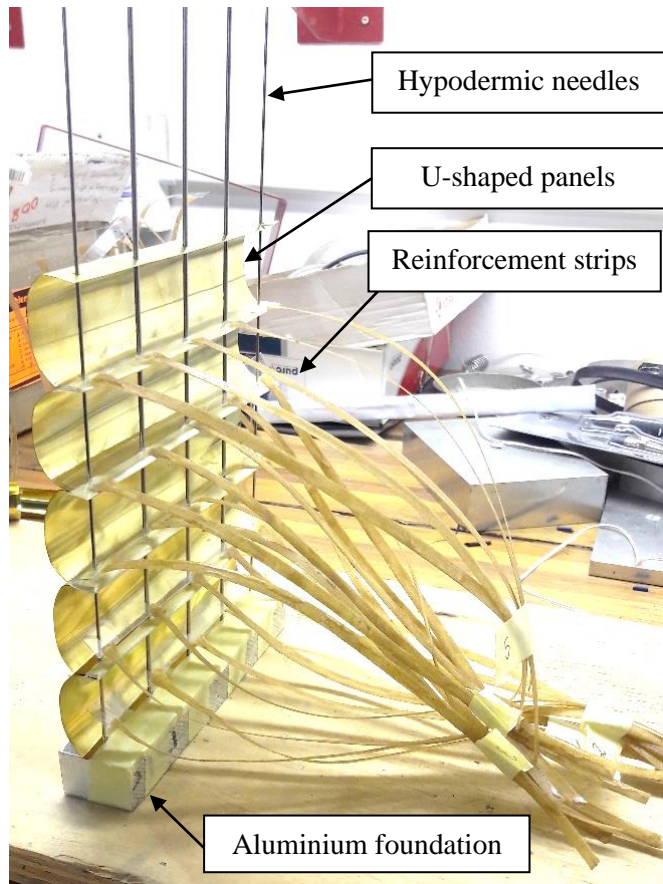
Partly assembled soil wall facing with reinforcement strips.
